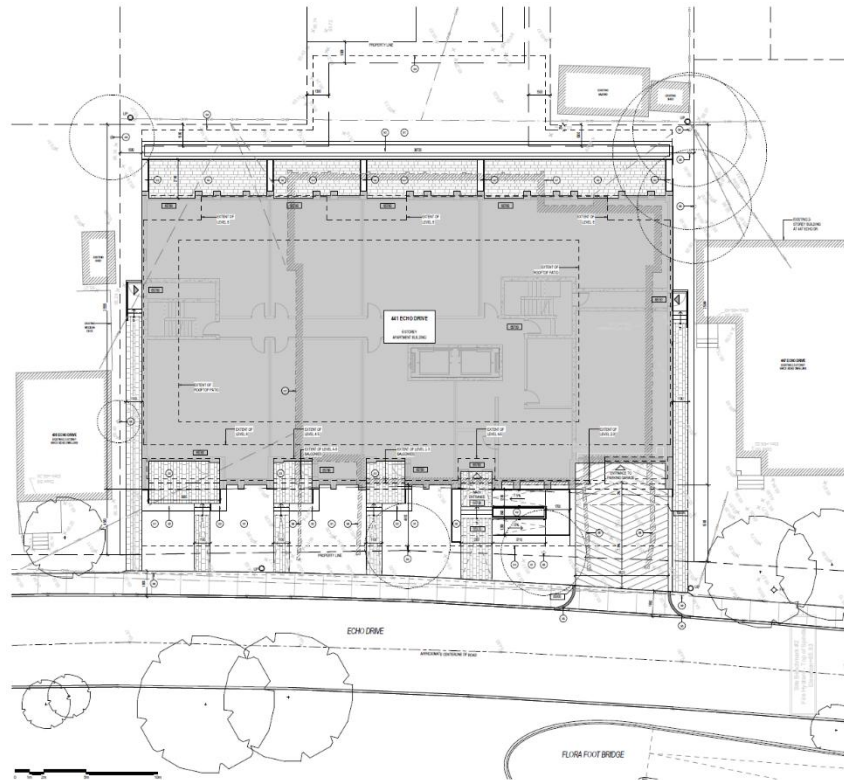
Site plan of 441 Echo Drive (Source: Project1 Studio)
